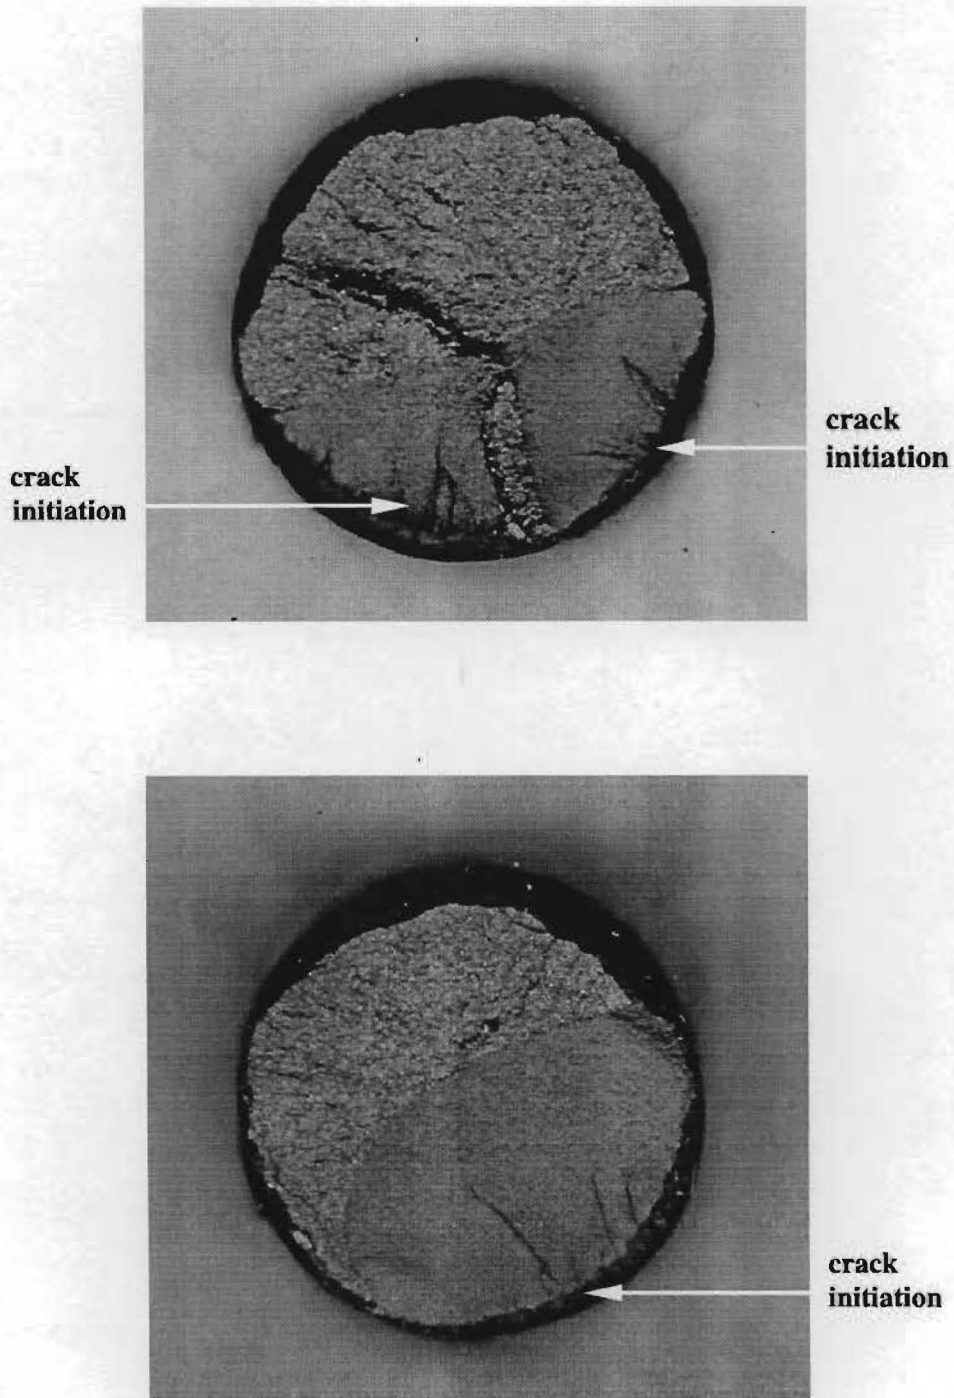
Fatigue Crack Surfaces on N5S Bars
